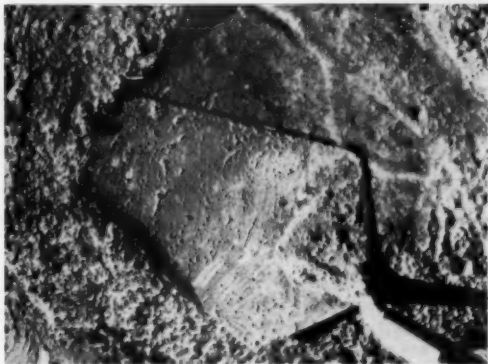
A CONCRETE MIXTURE WITH AN EXCESS OF CEMENT-SAND MORTAR
